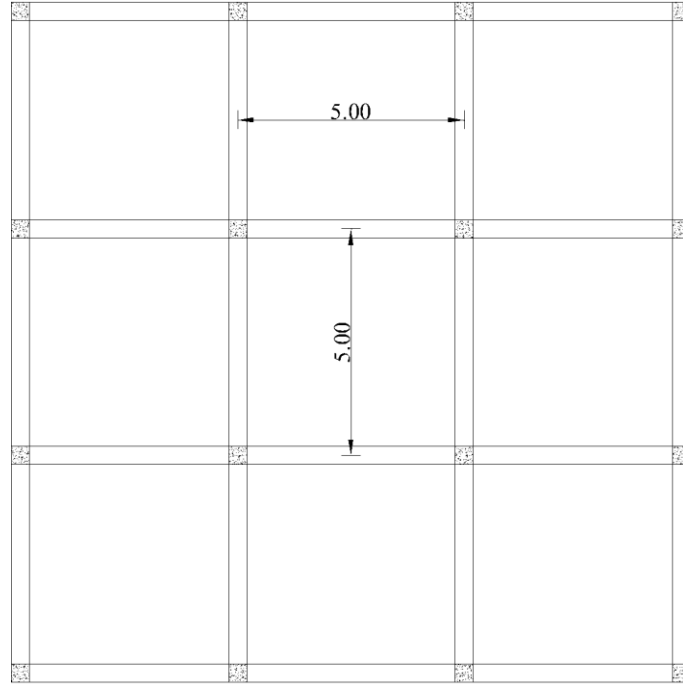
Ground floor plan of a typical floor of the structure (dimensions in m)
